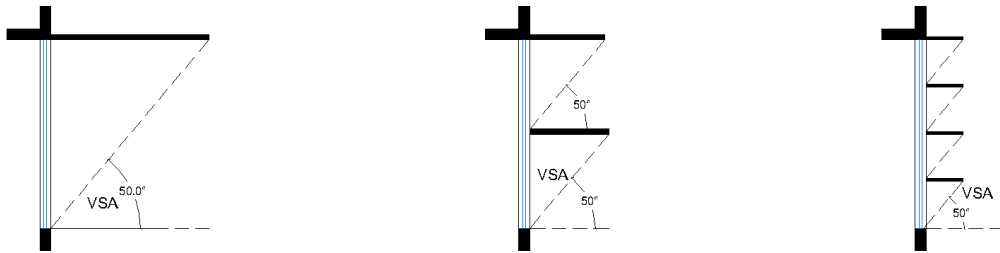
South orientation solar shading element 50o degree angle –Elevation.
